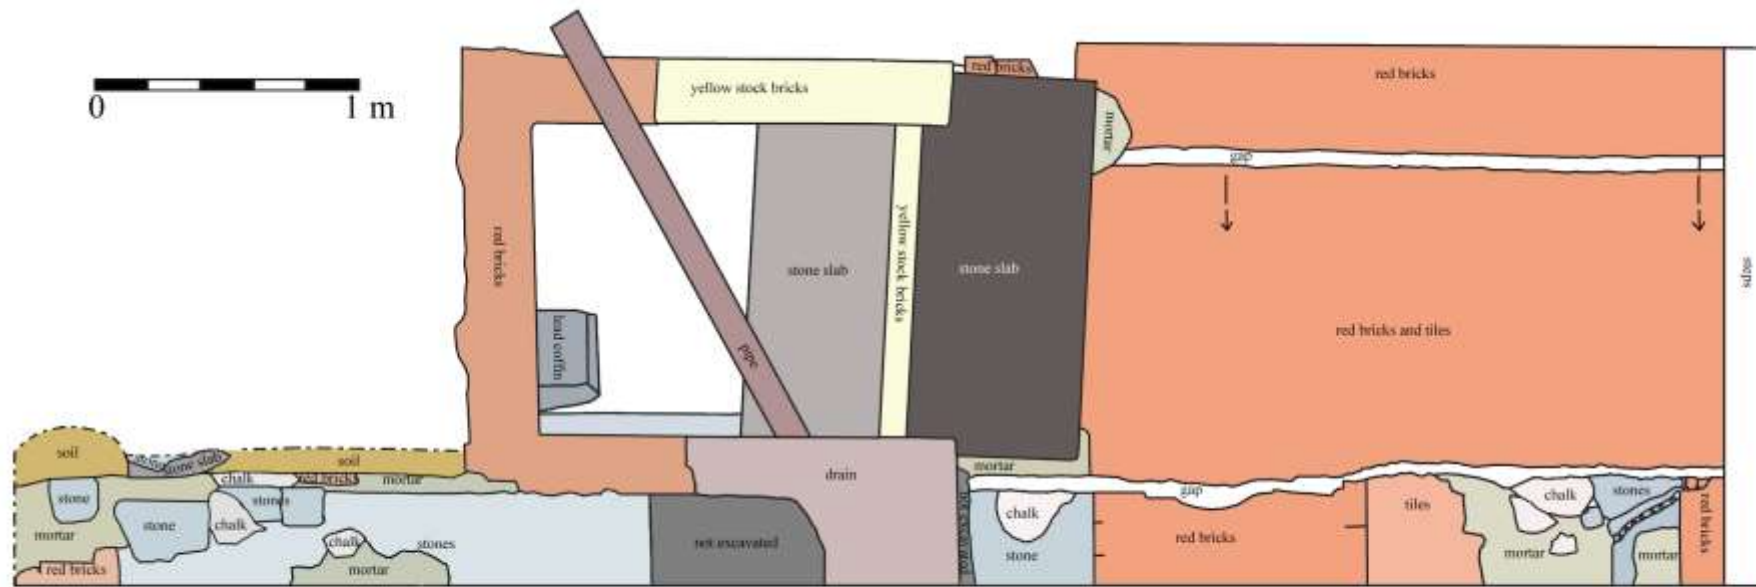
A multi-phase plan of the vault(s) and adjacent Church wall, with north at the top of frame
